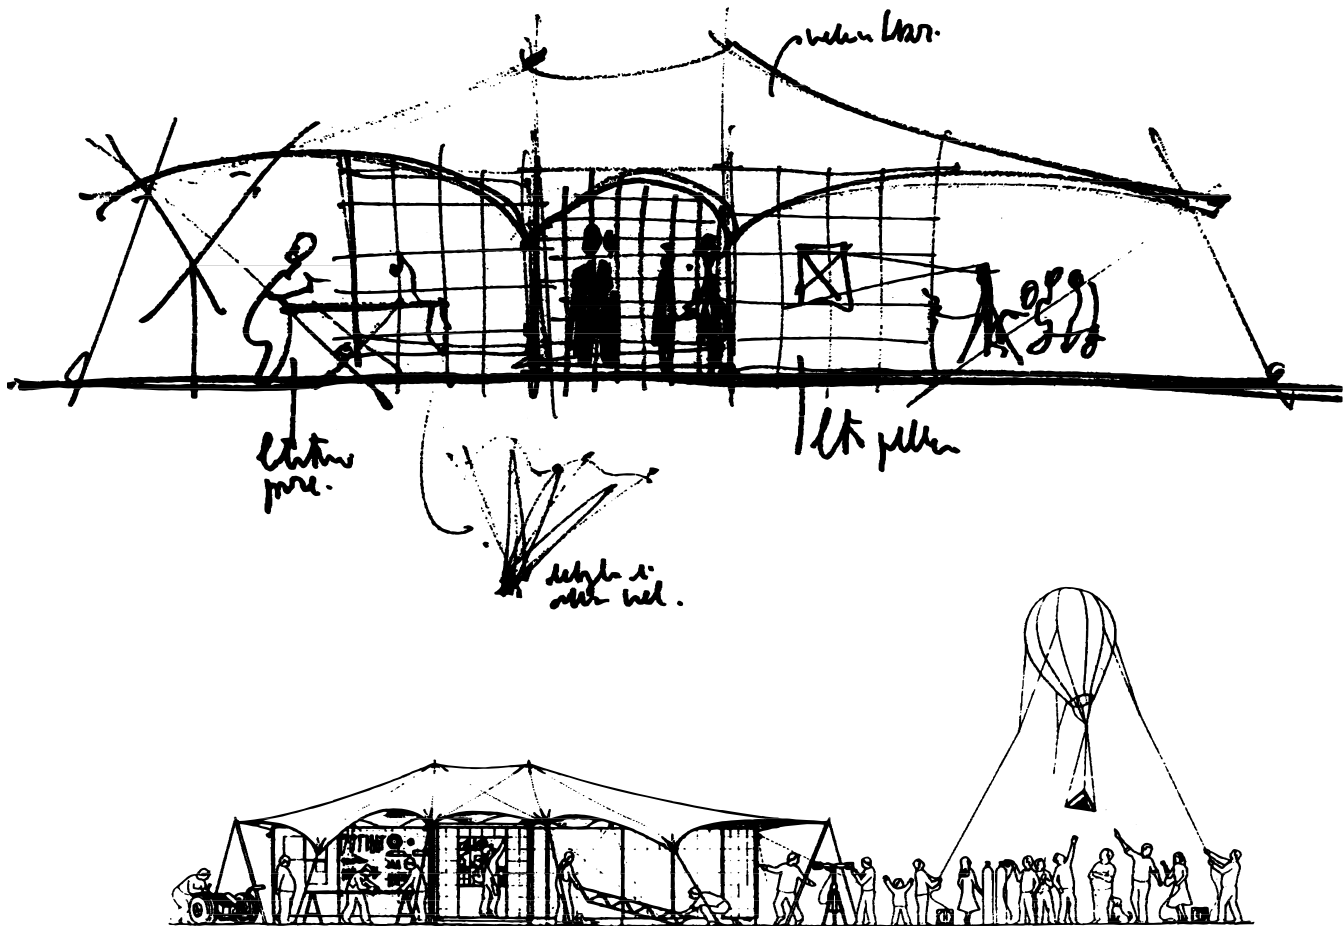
Urban renovation pavilion, 1979, Renzo Piano Building Workshop. Conceptual and presentation design drawings.
